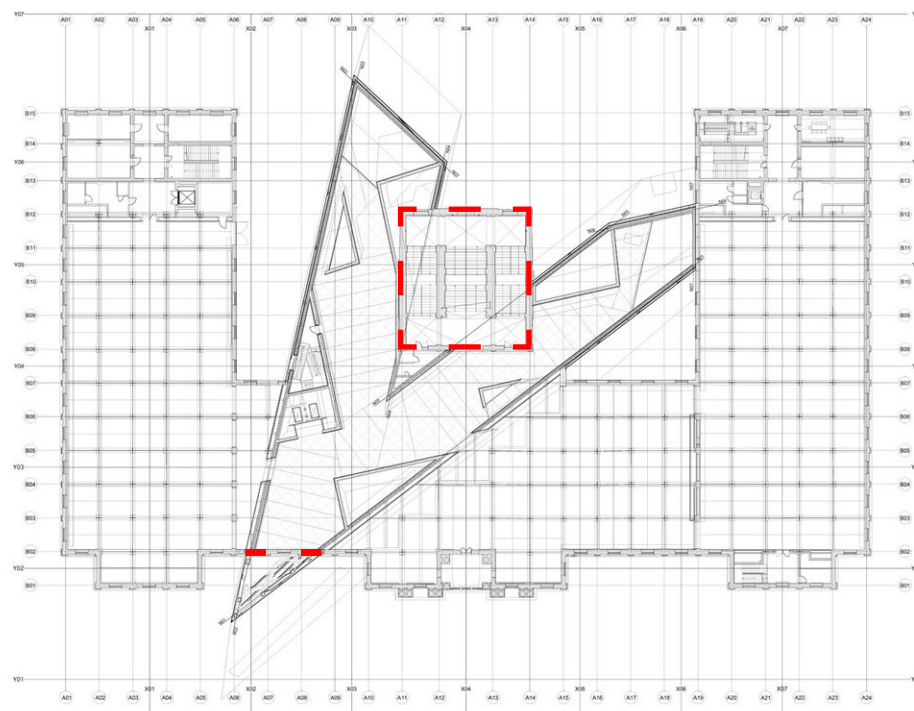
Second floor Military Museum. Highlighted in red the portion of the front facade that the addition bisect and the original stairs of the old arsenal building. (Image Source: <http://europaconcorsi.com/projects/182957-Military-History-Museum>)
